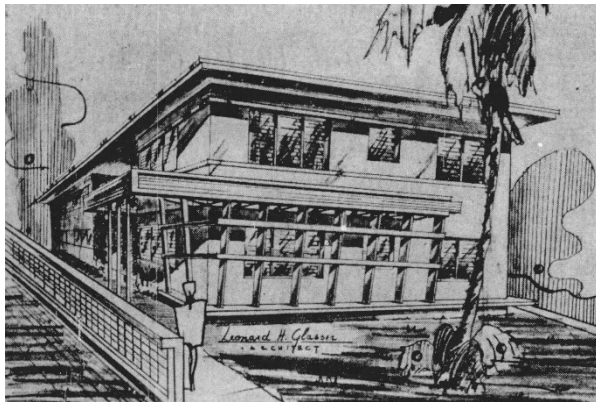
Rendering of apartment building on Abbott Avenue, Surfside, 1950.
